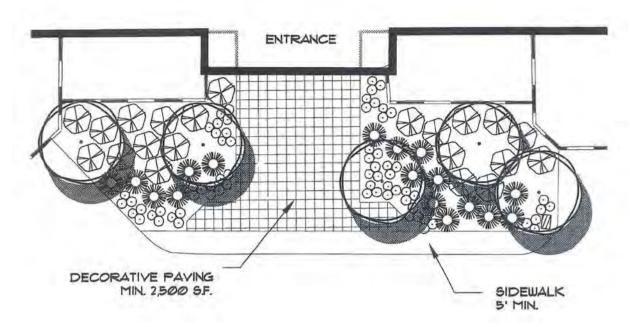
TYPICAL PUBLIC OPEN SPACE CONCEPT
